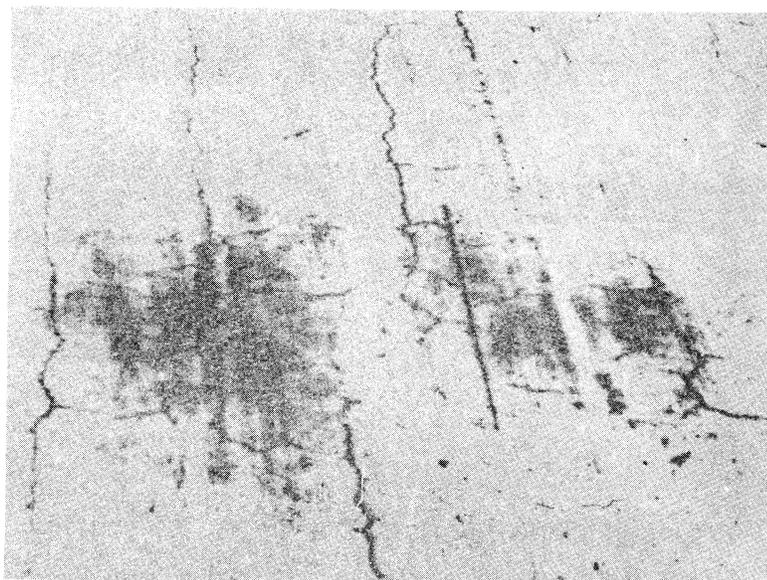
Typical cracking in the latex modified mortar overlay. Note that the deck is damp, which makes the cracks easily discernible.
